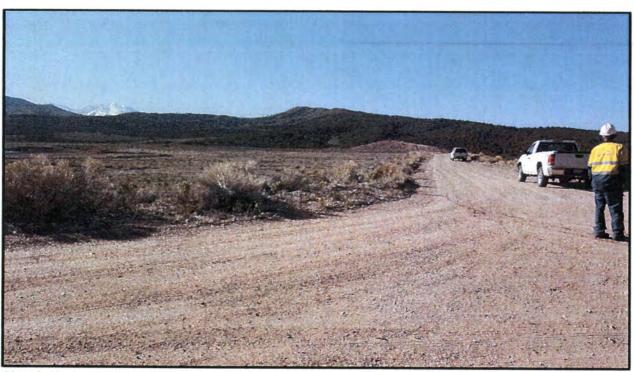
North end of dam at right abutment, looking south over upstream face, beach, and dam crest road.
